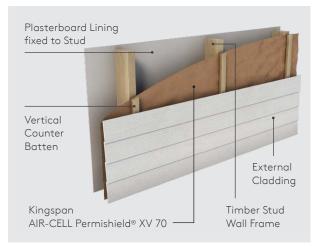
Kingspan AIR-CELL Permishield® XV 70 in a timberframed wall installation using counter-battens.
